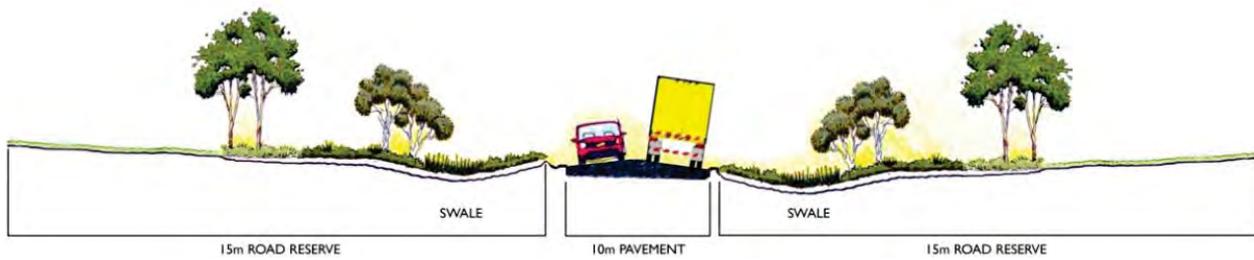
Schematic Cross-section of Road and Swale Design at the KSIA (Source: RPS, LWMS, 2014)
